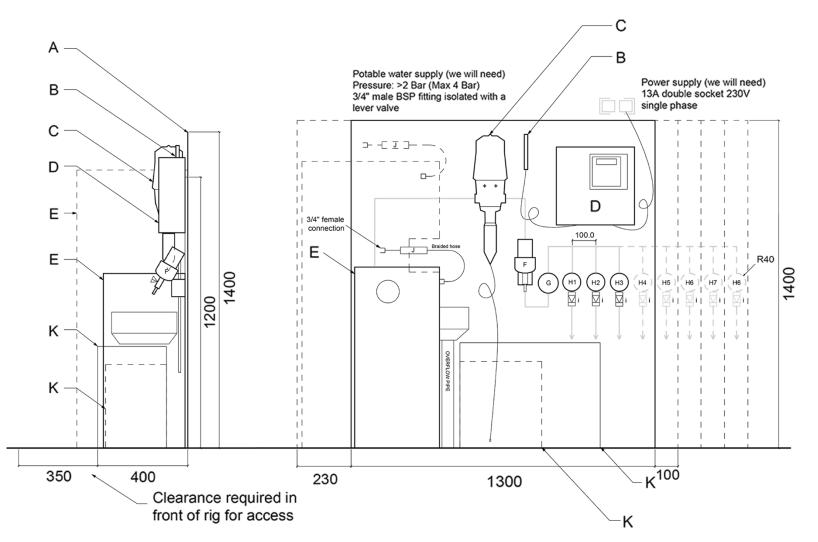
Irrigation System (Side View and Elevation View)(Green Wall Specification and Drawings - Biotecture, n.d.)
